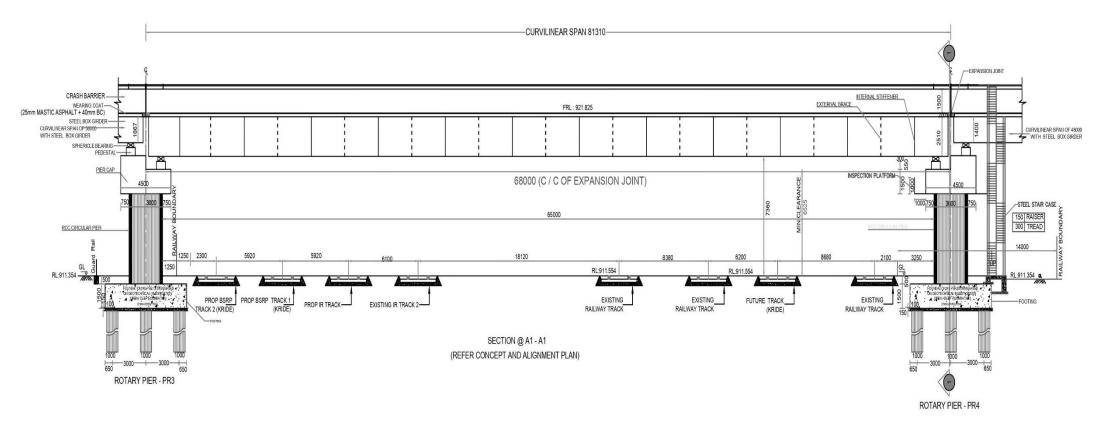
Typical Cross Section of Rotary Span of 81.31m
